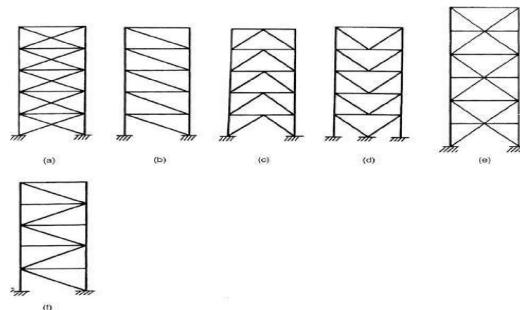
Typical concentric braced frame (CBF) configurations: (a) One-storey X-bracing; (b) Single-diagonal bracing; (c) and (d) Chevron bracings; (e) two-storey X-bracings; (f) Single-diagonal alternate-direction bracing.
